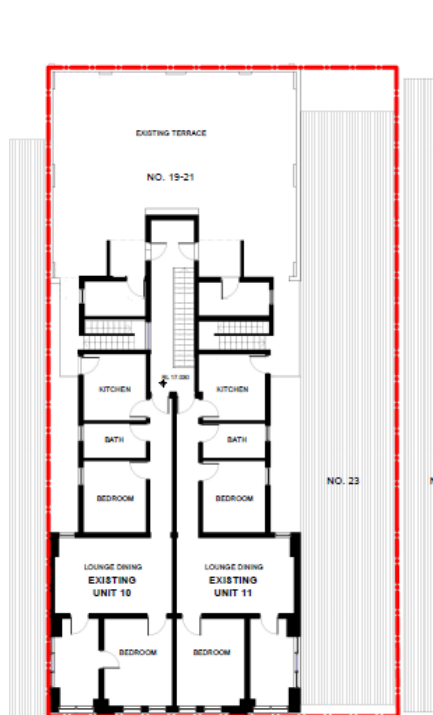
Existing Third Floor Plan. (Source: NBRSArchitecture)
